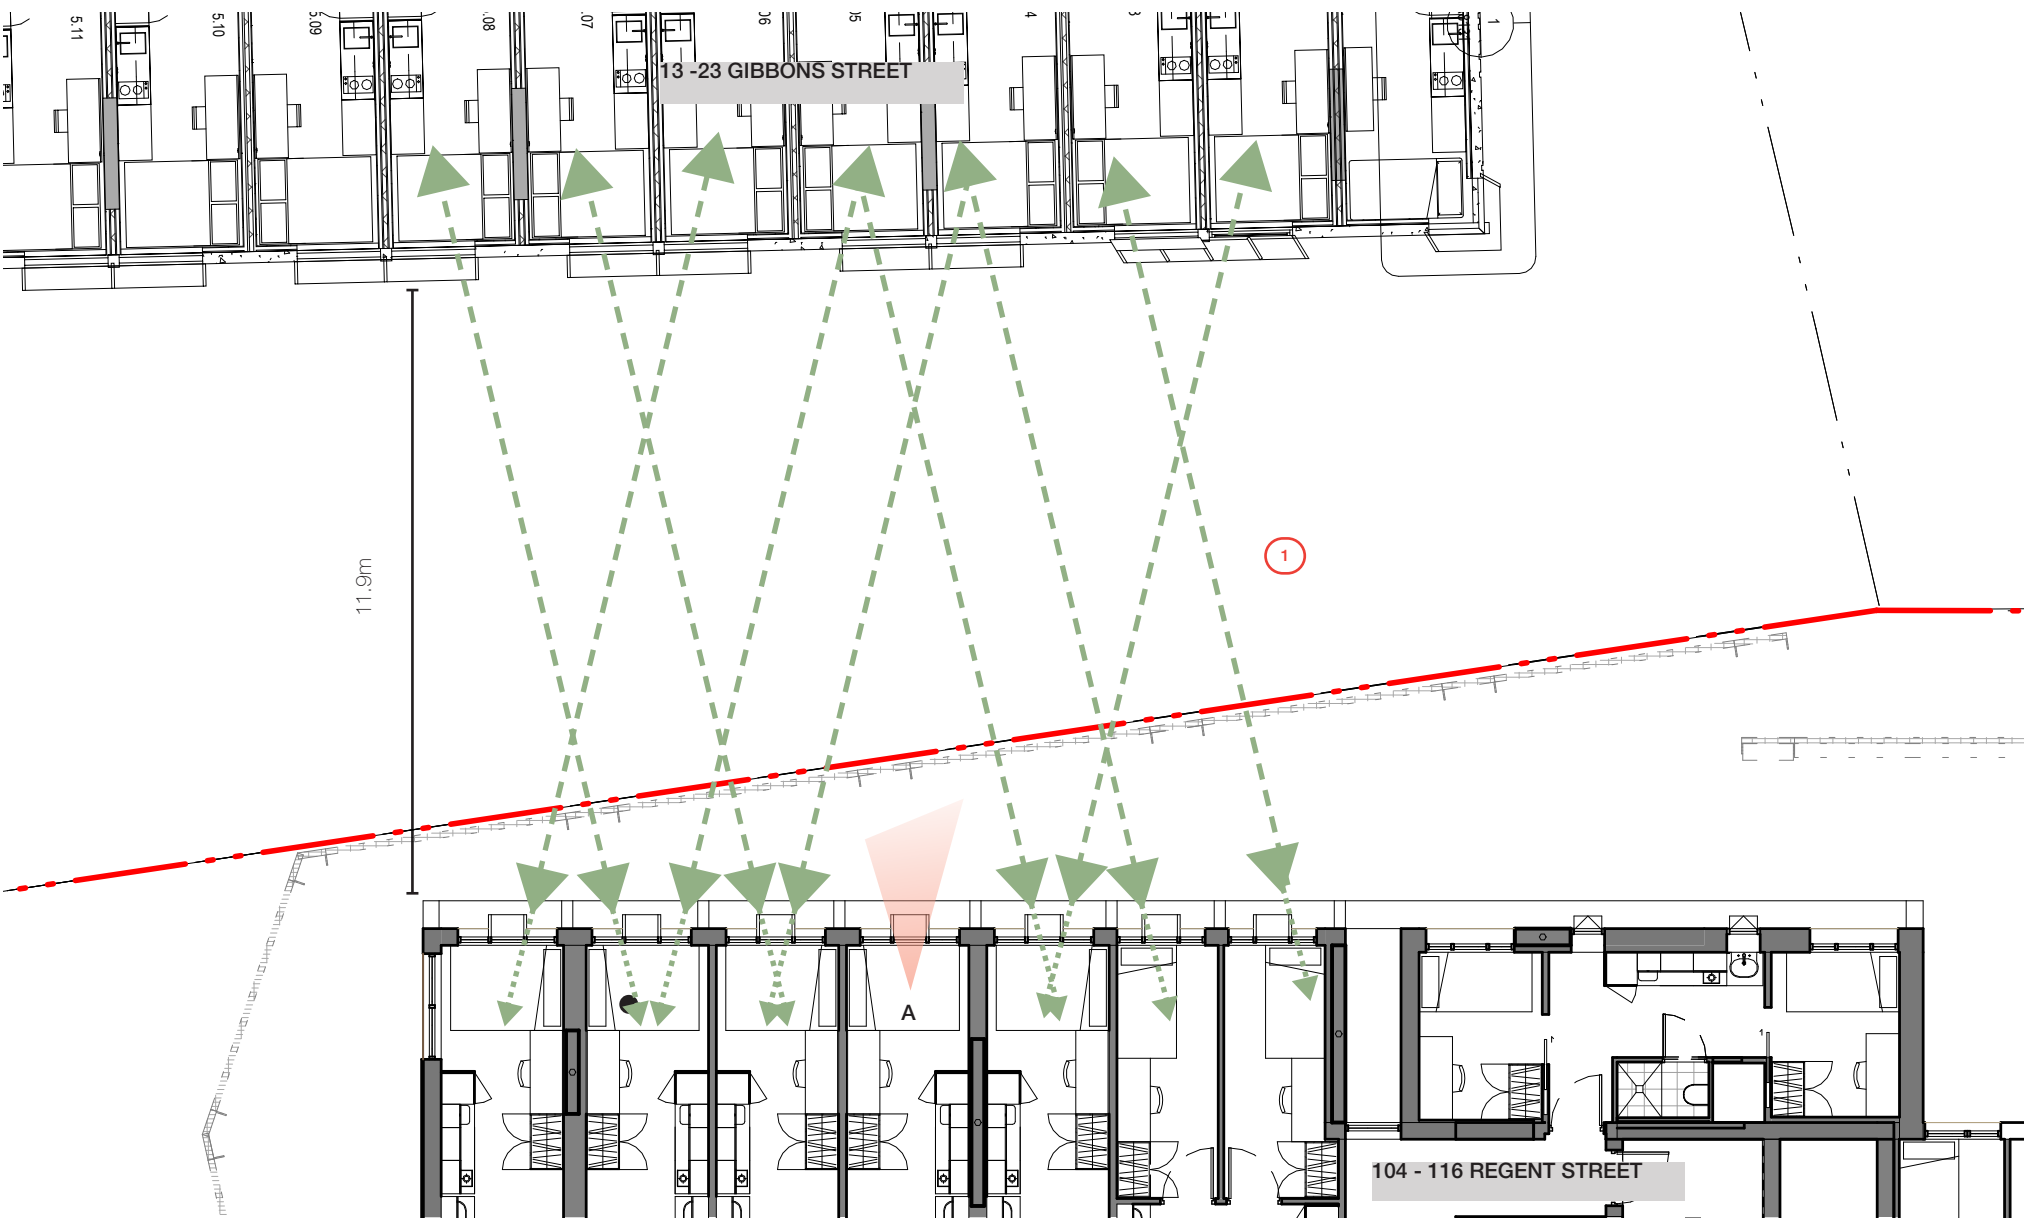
NORTH FACADE - PRIVACY LOUVERS
